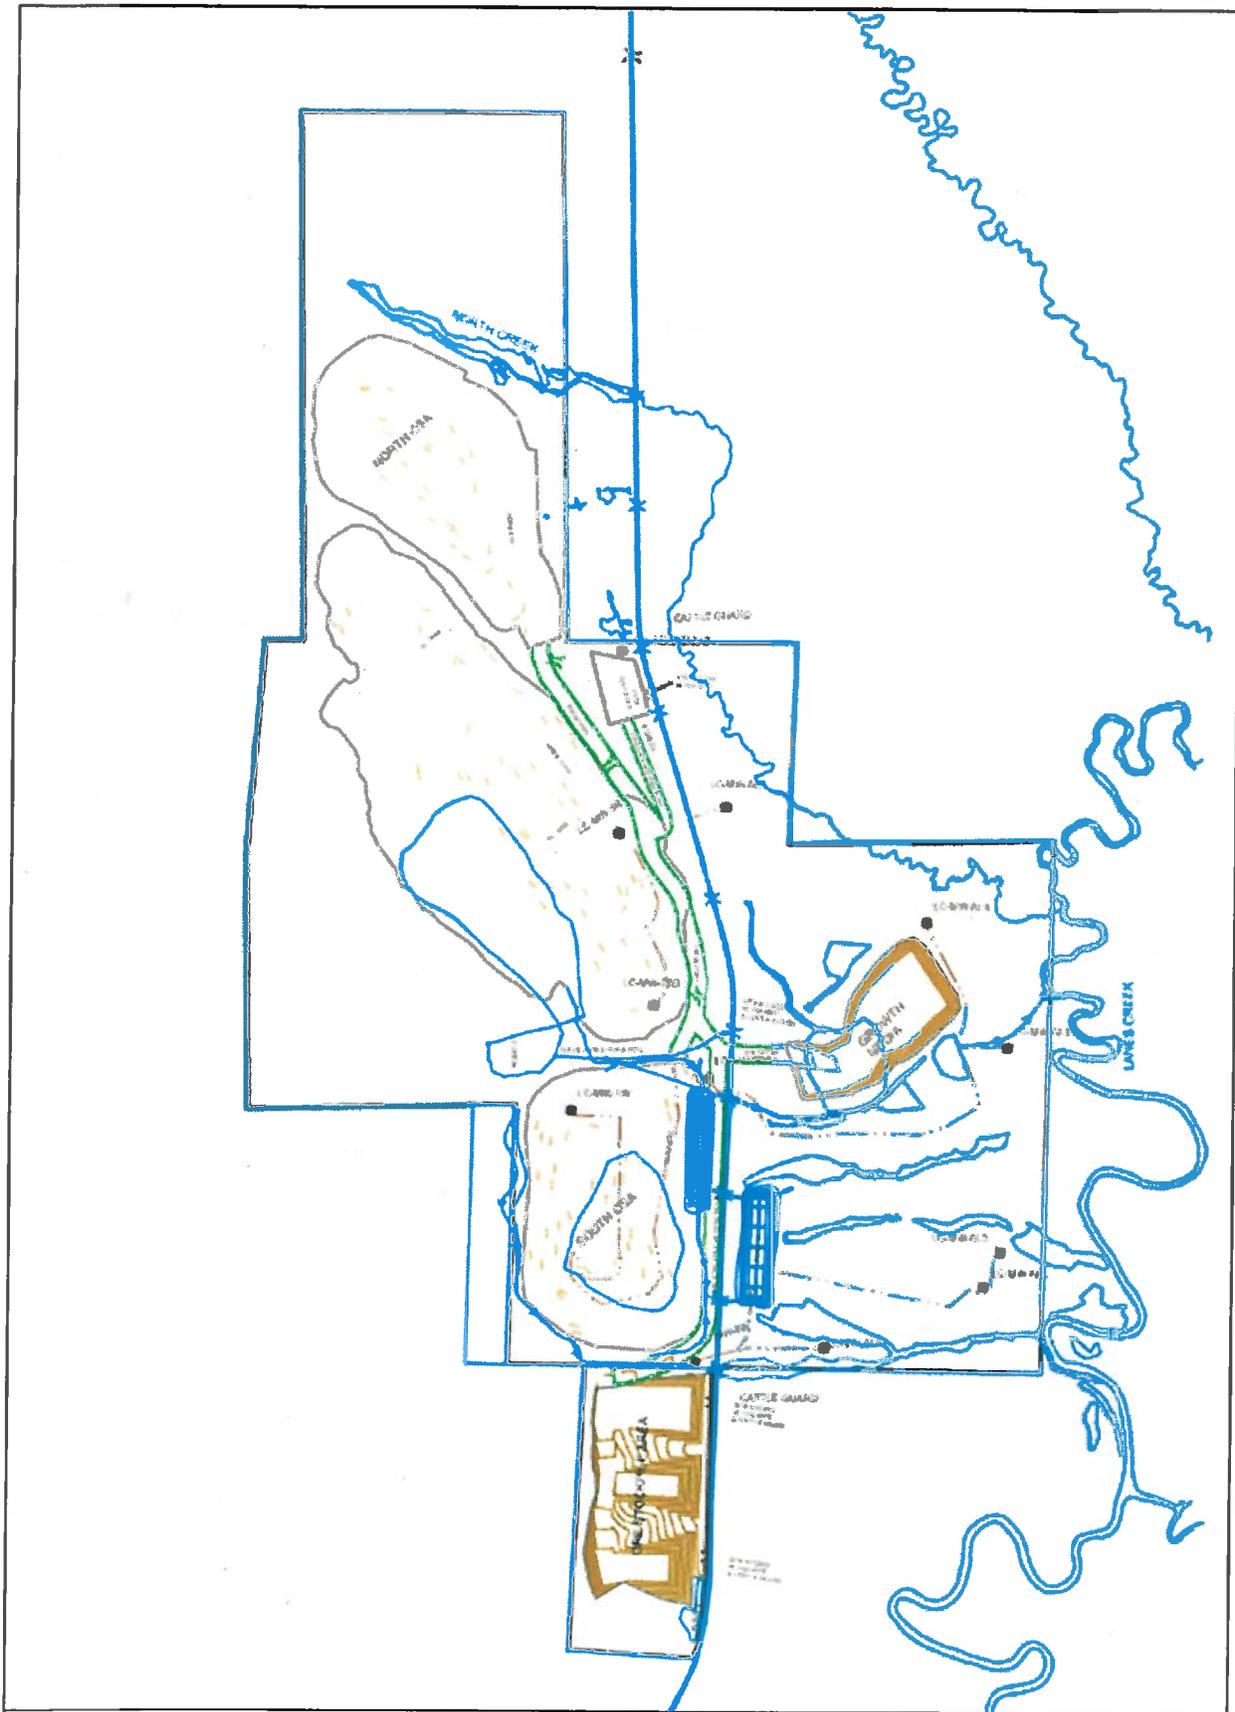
LANES CREEK MINELAYOUT- CAD DRAWING
